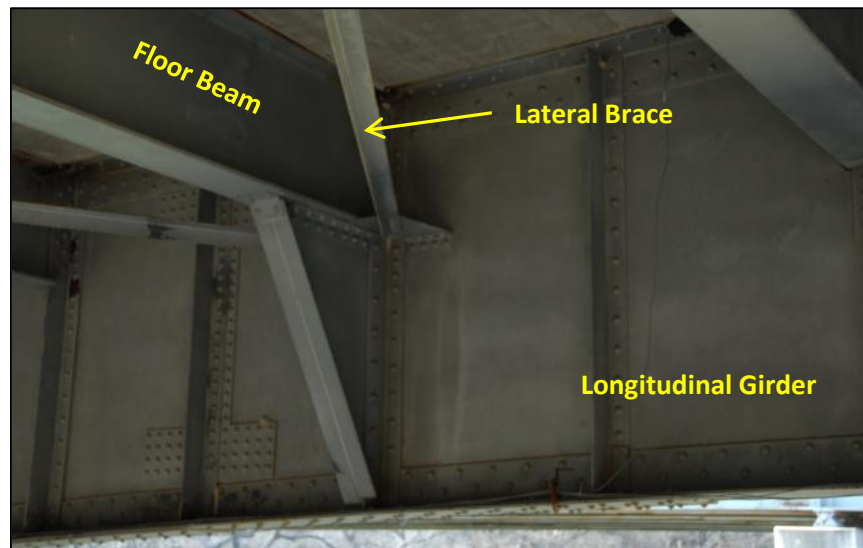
Close-up view of lateral brace and floor beam framing into a longitudinal girder at the Medina River Bridge.
